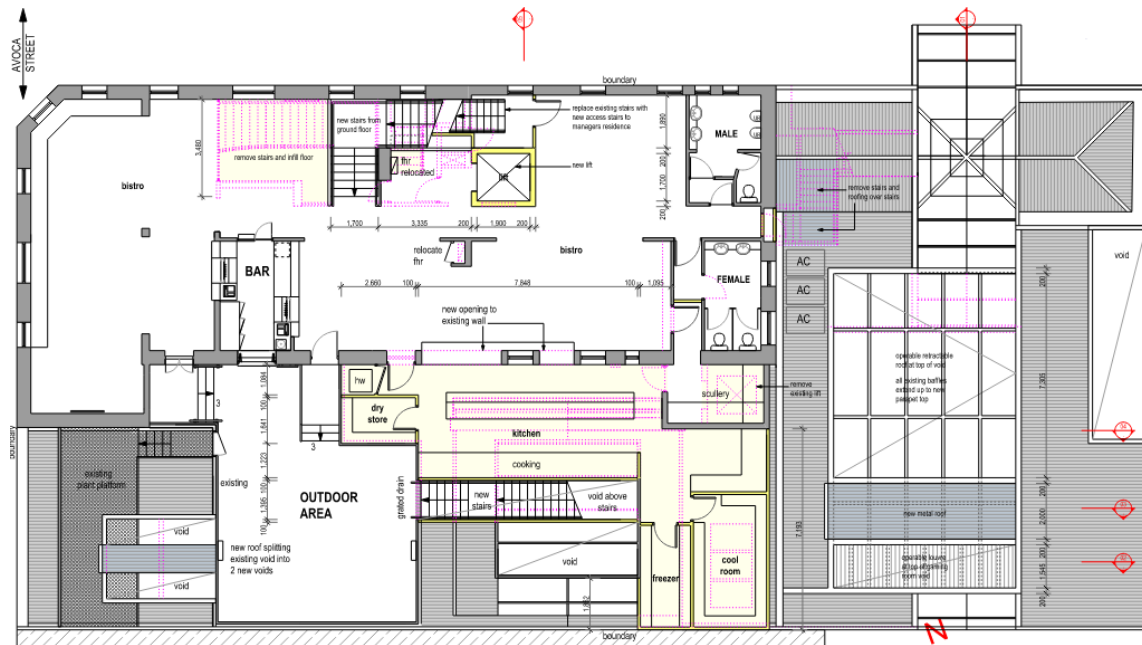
Proposed first floor plan (Source: Darren Mah Design)
